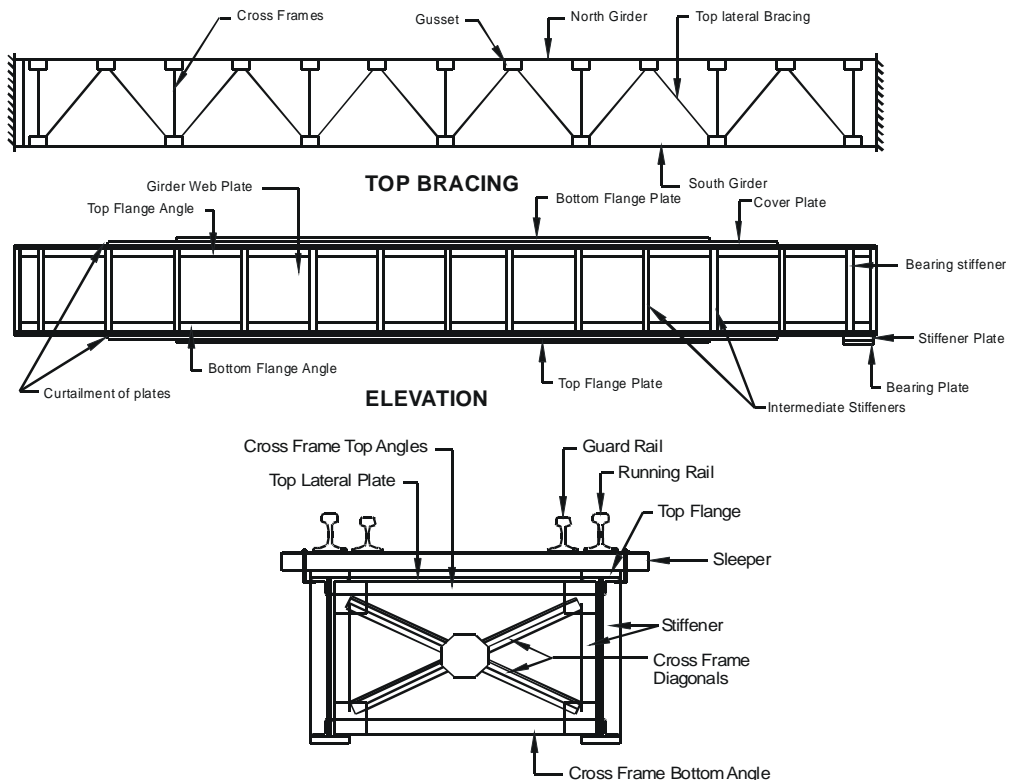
Side Elevation and cross section of a typical riveted plate girder
